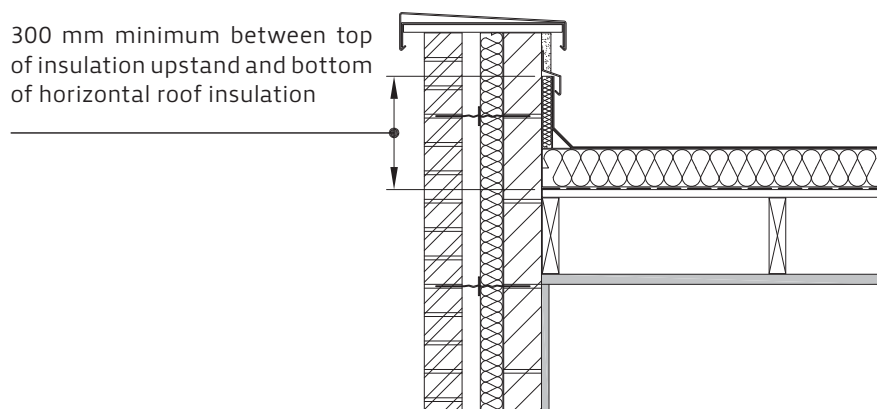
Cavity wall insulation - Flat roof - Parapet
